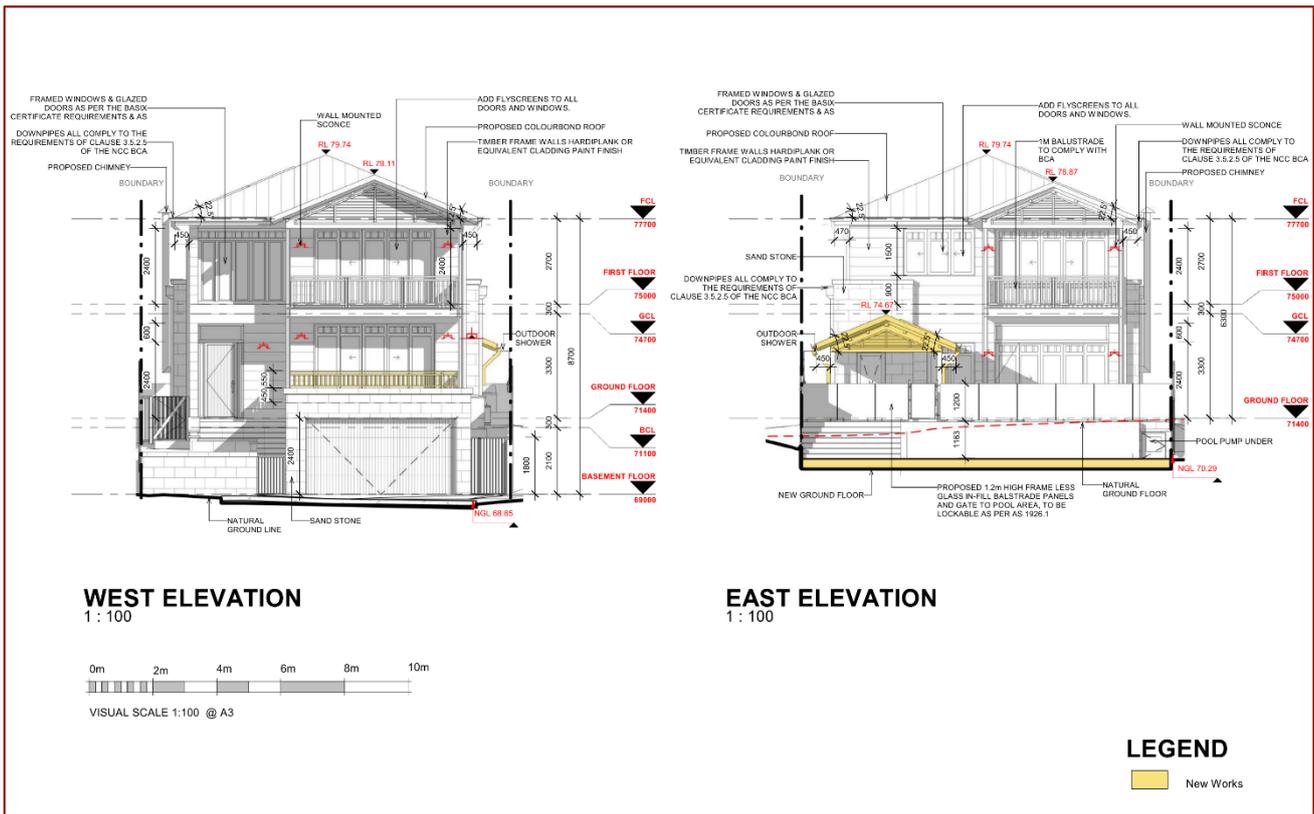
BASIX sample Detached dwelling West & East Elevation
